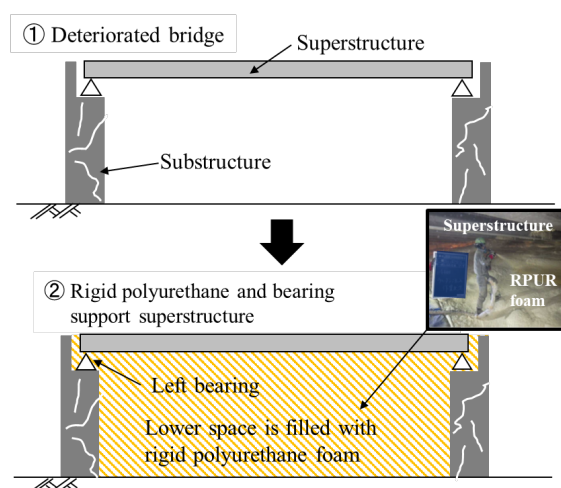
Renovation of the deteriorated bridge to lightweight embankment.
